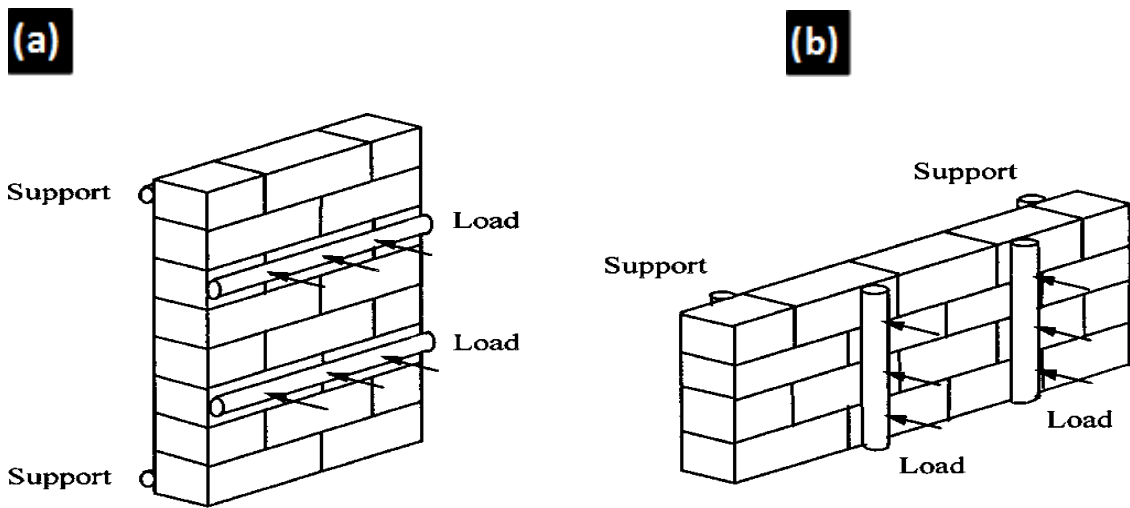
Testing arrangement of wallettes (small walls), BS 5628
